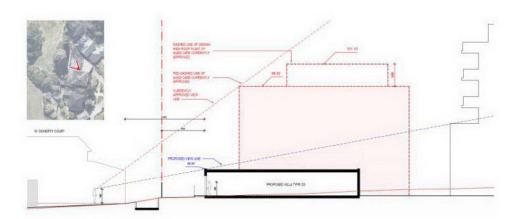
Section C showing views from 18 Dougherty Court (Source: Via Architects)
